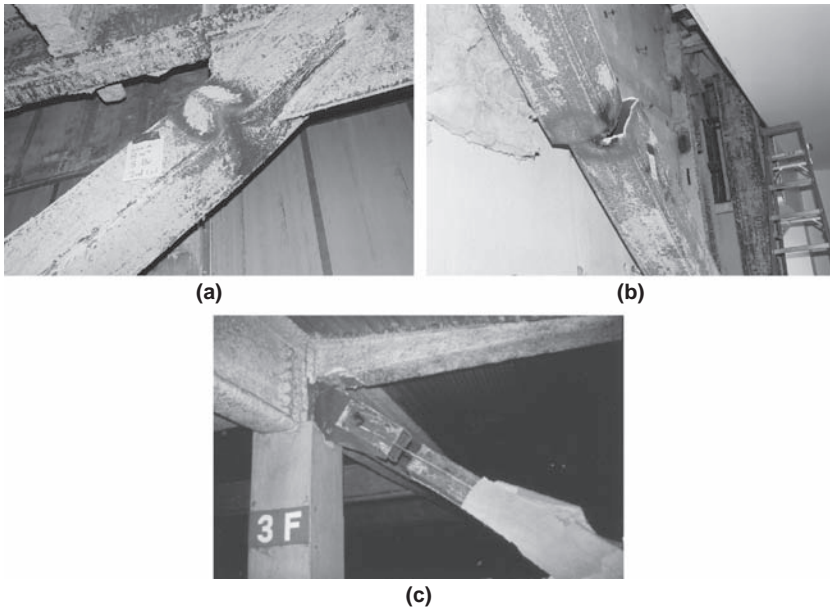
Rectangular HSS braces: (a and b) buckled and fractured—Northridge earthquake. (Courtesy of Degenkolb Engineers); (c) fractured—Kobe earthquake. (Courtesy of Dennis Mitchell, Department of Civil Engineering and Applied Mechanics, McGill University.)
